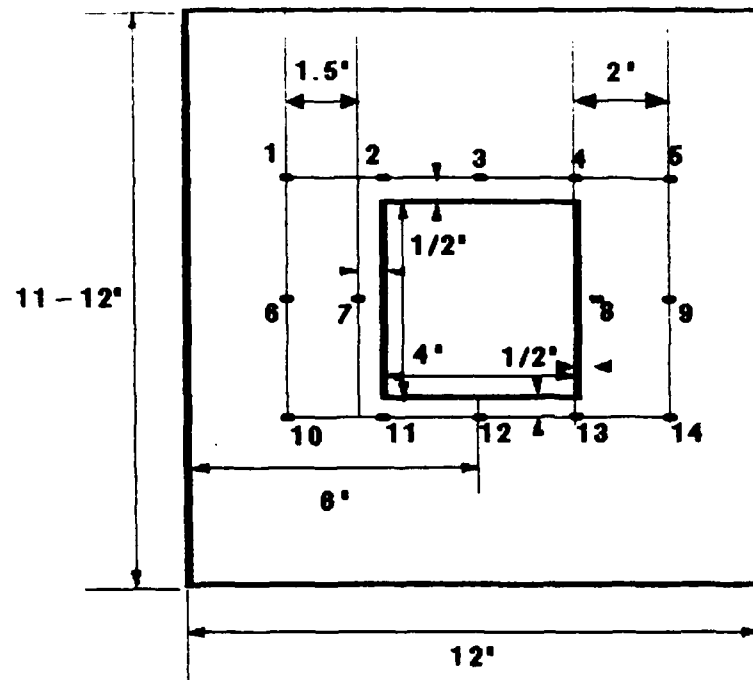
LVDT Positions, 12" Panel, 4" Cutout, Centered
